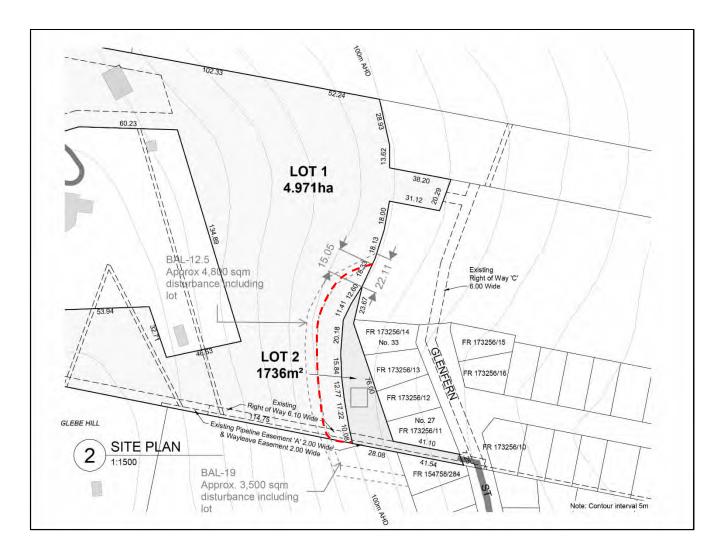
Proposed subdivision indicating the extent of the HMA around New lot (BAL 19). (Note: Please note the HMA will not extend into the reserve to the south of the new lot although shown)
